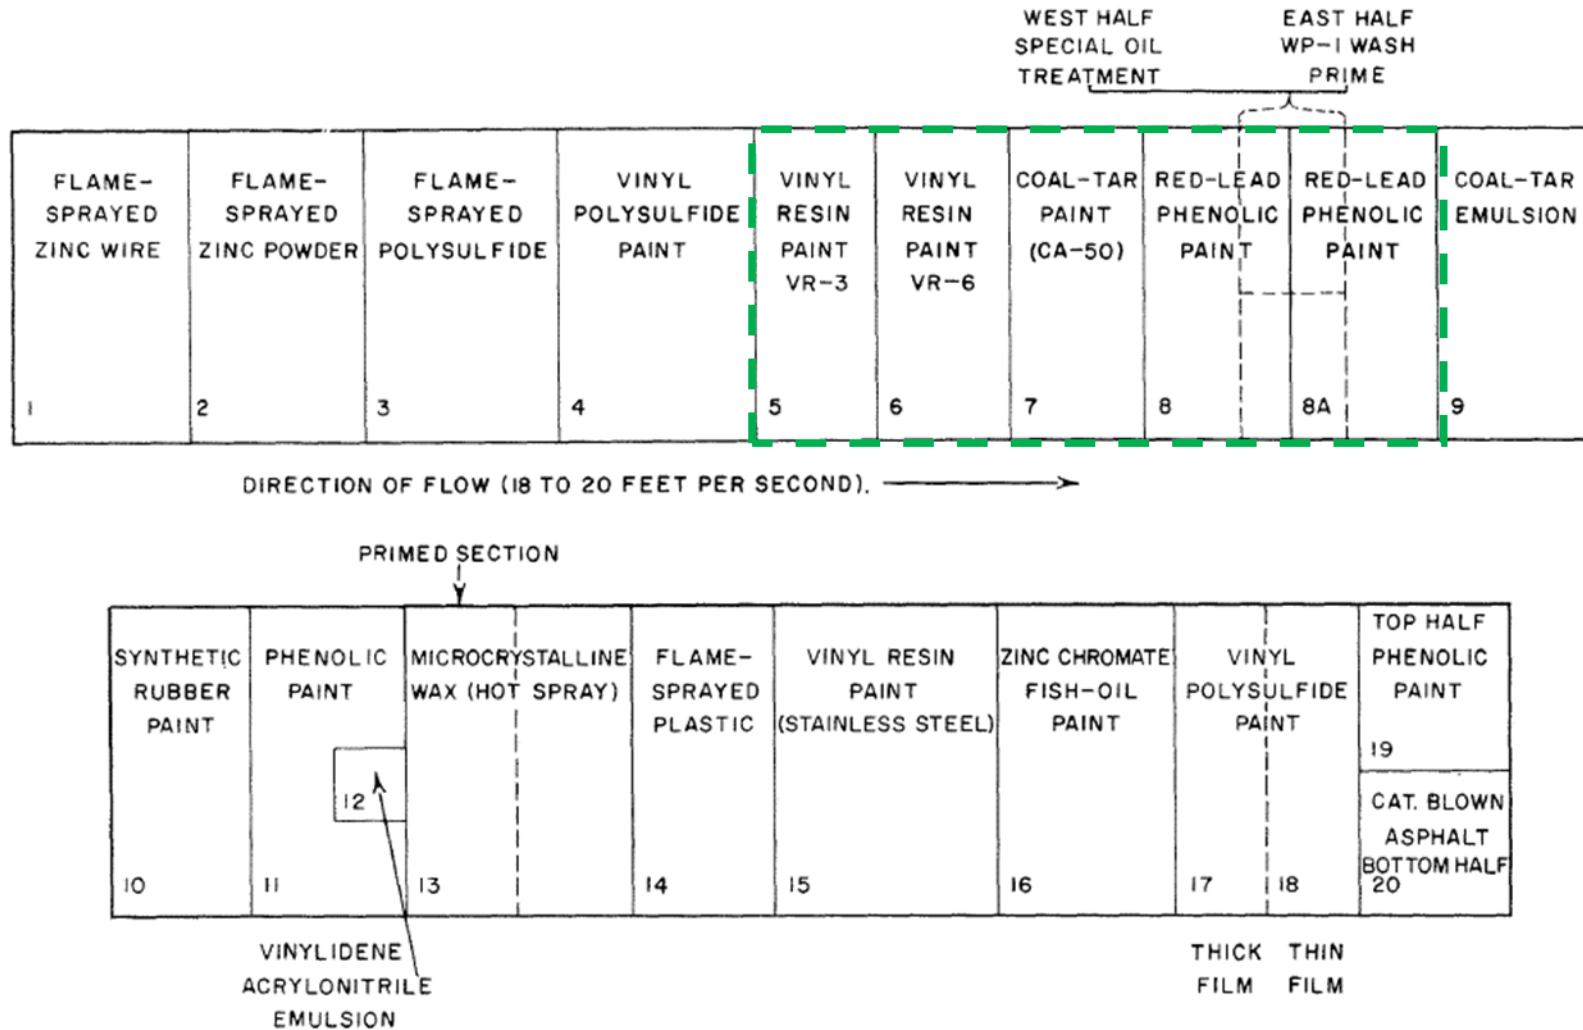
Shasta test section layout. The test sections remaining in the 2019 inspection are noted with a dashed green border.
